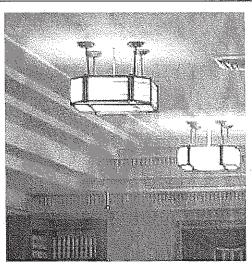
Joining of remodeled to original ceiling molding at southwest corner of courtroom.
